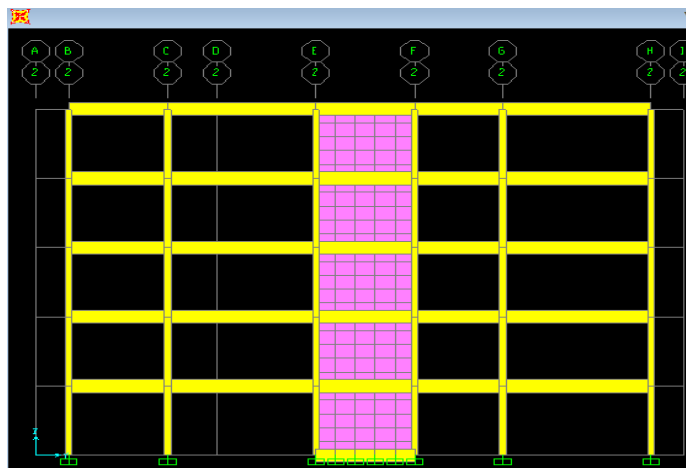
Modeling of shear wall in direction YZ at X=1.2 m
